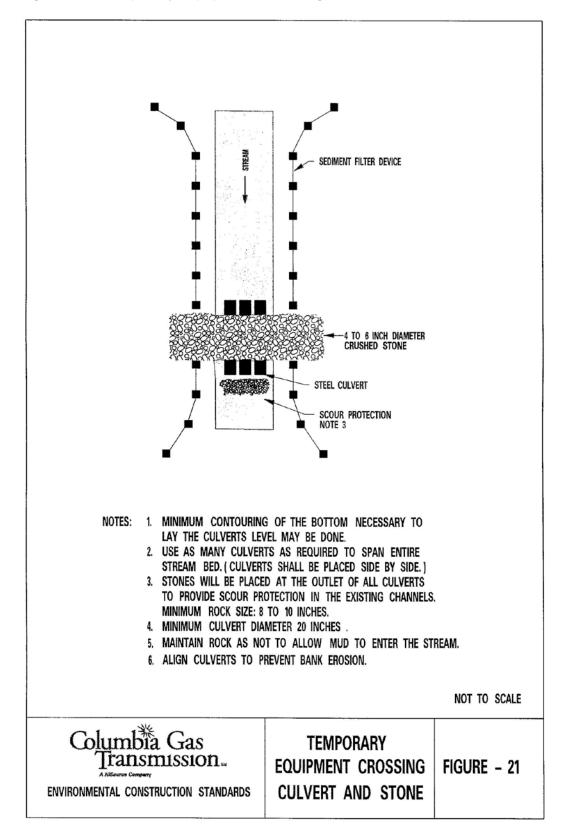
Temporary Equipment Crossing Culvert and Stone
